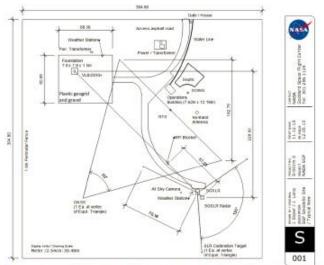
Notional Site Layout in the NASA Space Geodesy Project Plan highlighting the RF Site Blocking Scheme (Provided by Jaime Esper/NASA)
